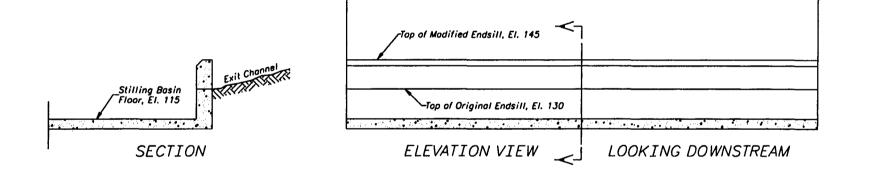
Structural modification #1, basin end sill raised 15-ft.
